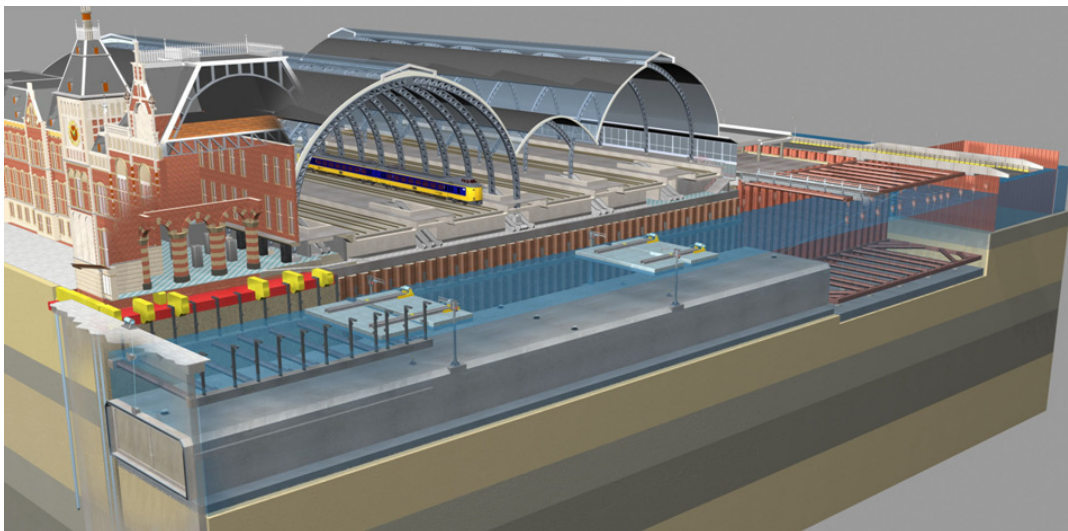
Overview tunnel element immersed underneath railway station (NS-line, Amsterdam)
